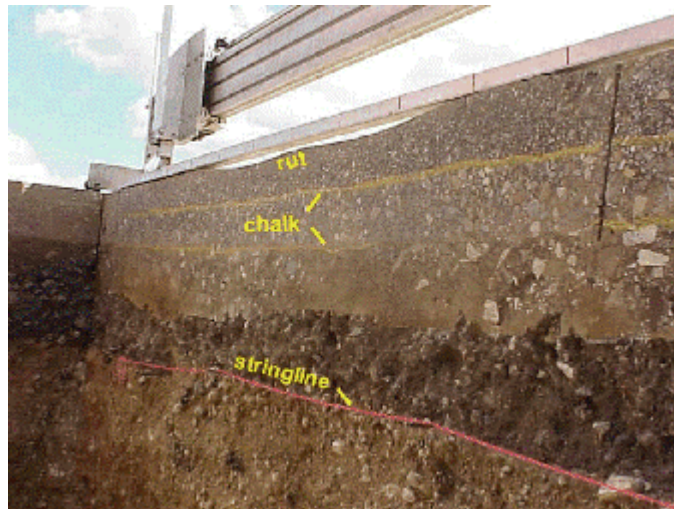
Trench sidewalls showing the pavement layer profile (Texas Department of Transportation 2011).
